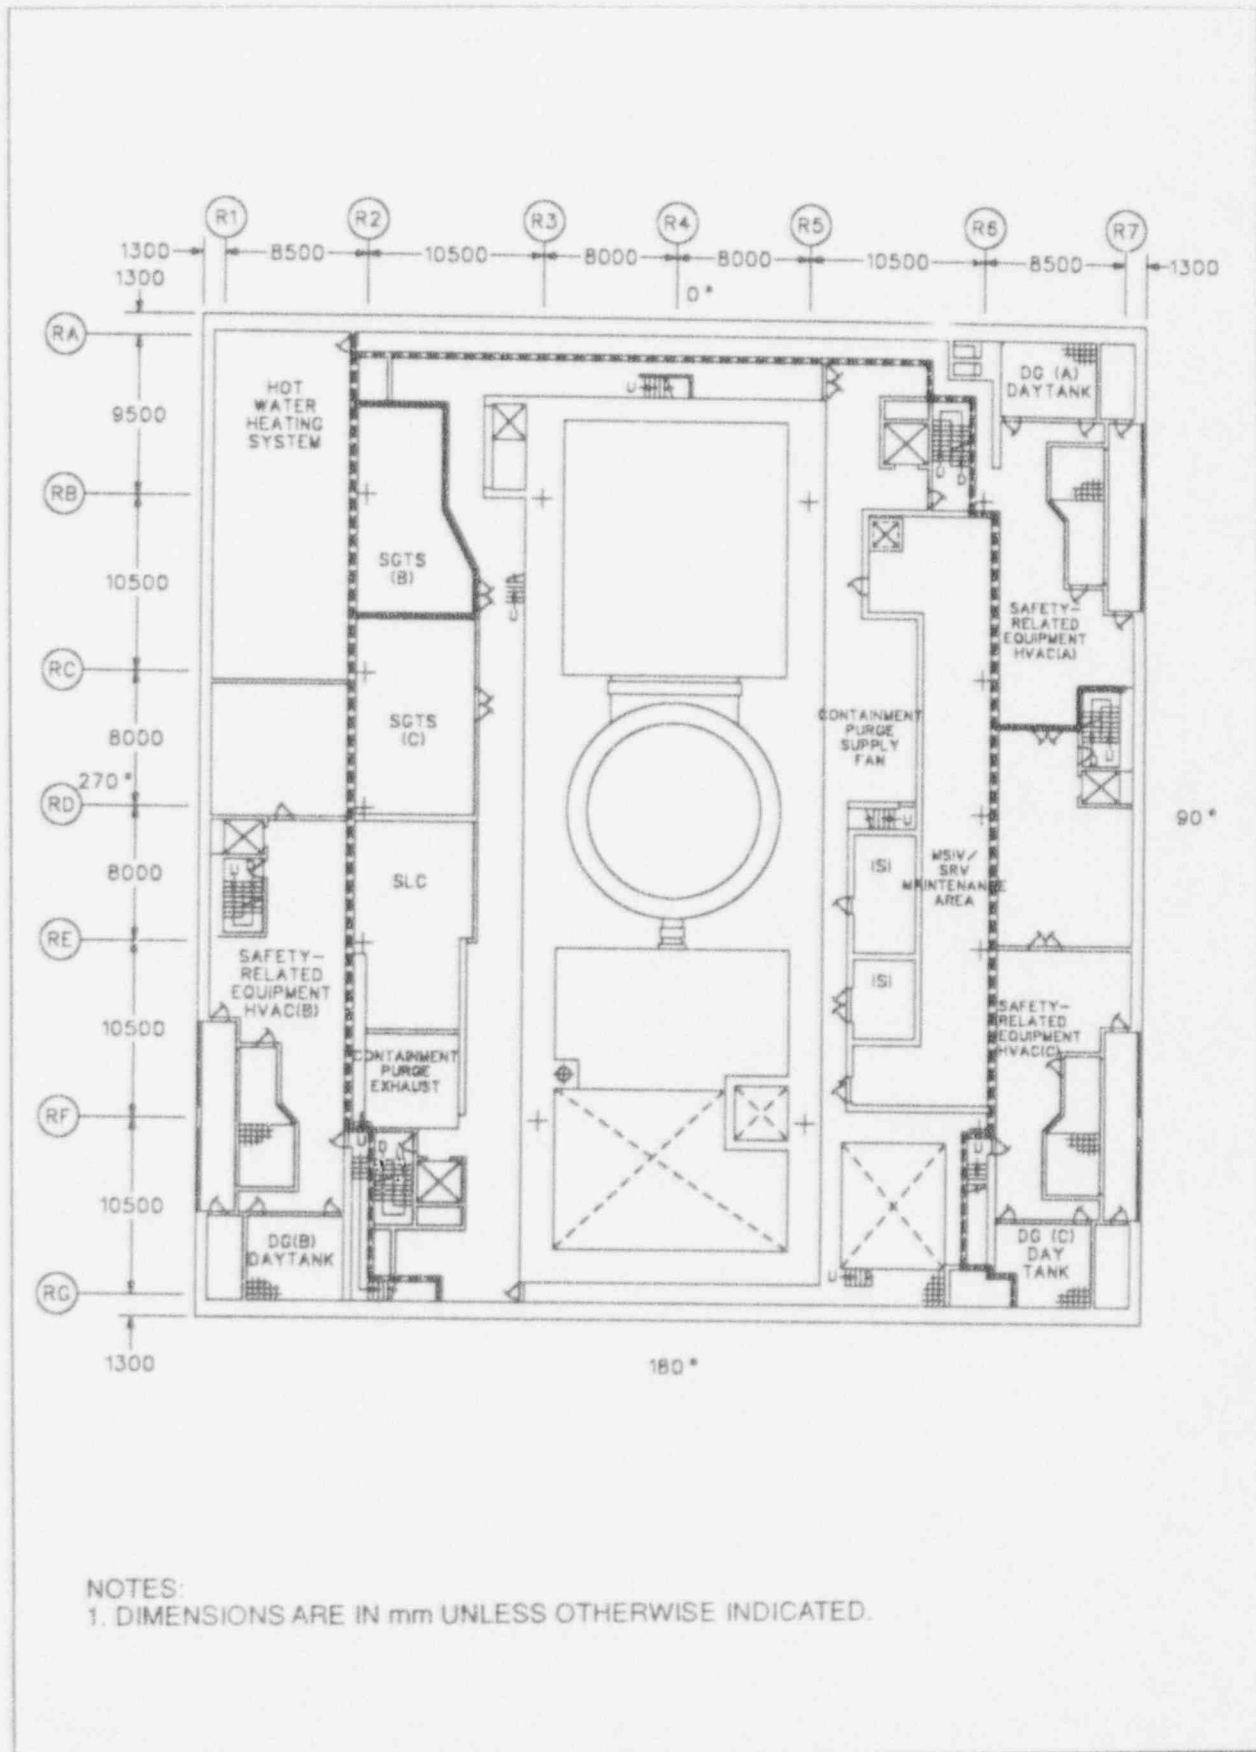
I Reactor Building Arrangement Floor 3F—Elevation 23500 mm
